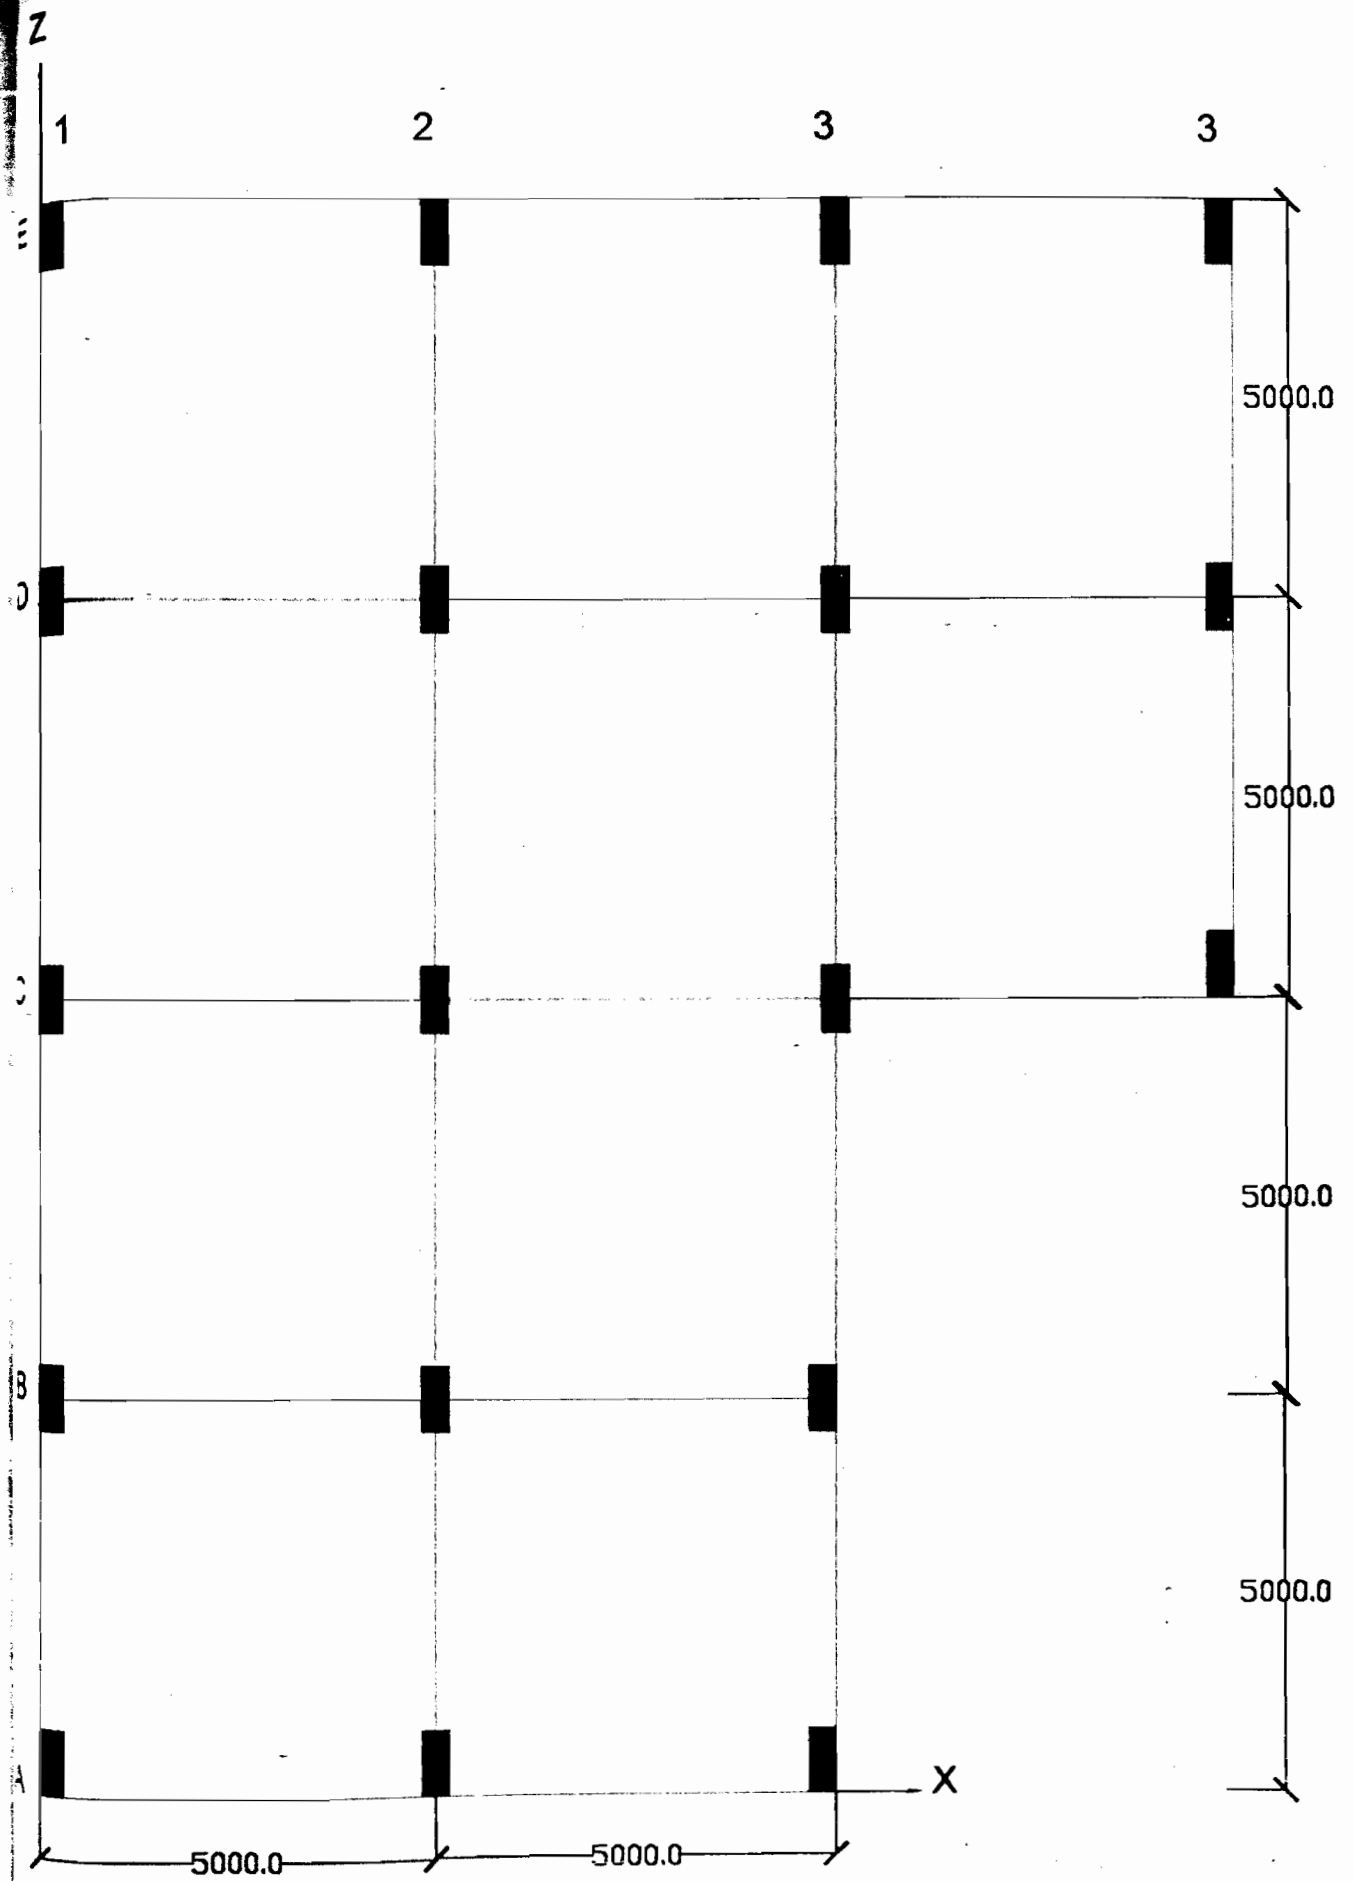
TYPICAL FLOOR PLAN OF UNSYMMETRICAL MULTI STOREYED BUILDING OF EXAMPLE 1
